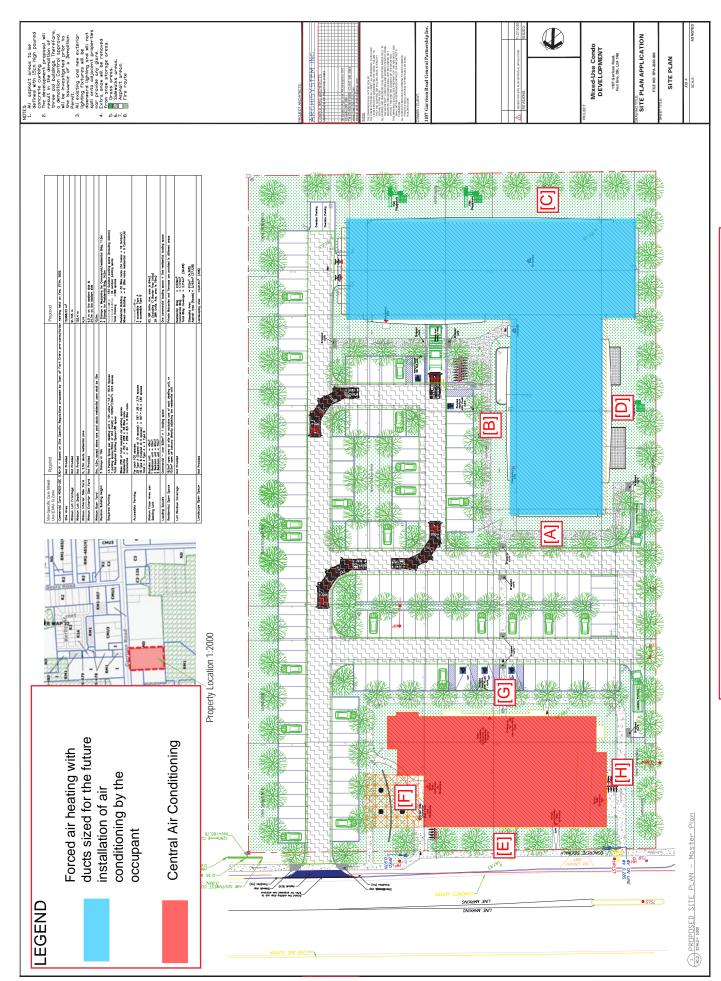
Proposed Site Plan Showing Ventilation Requirements
